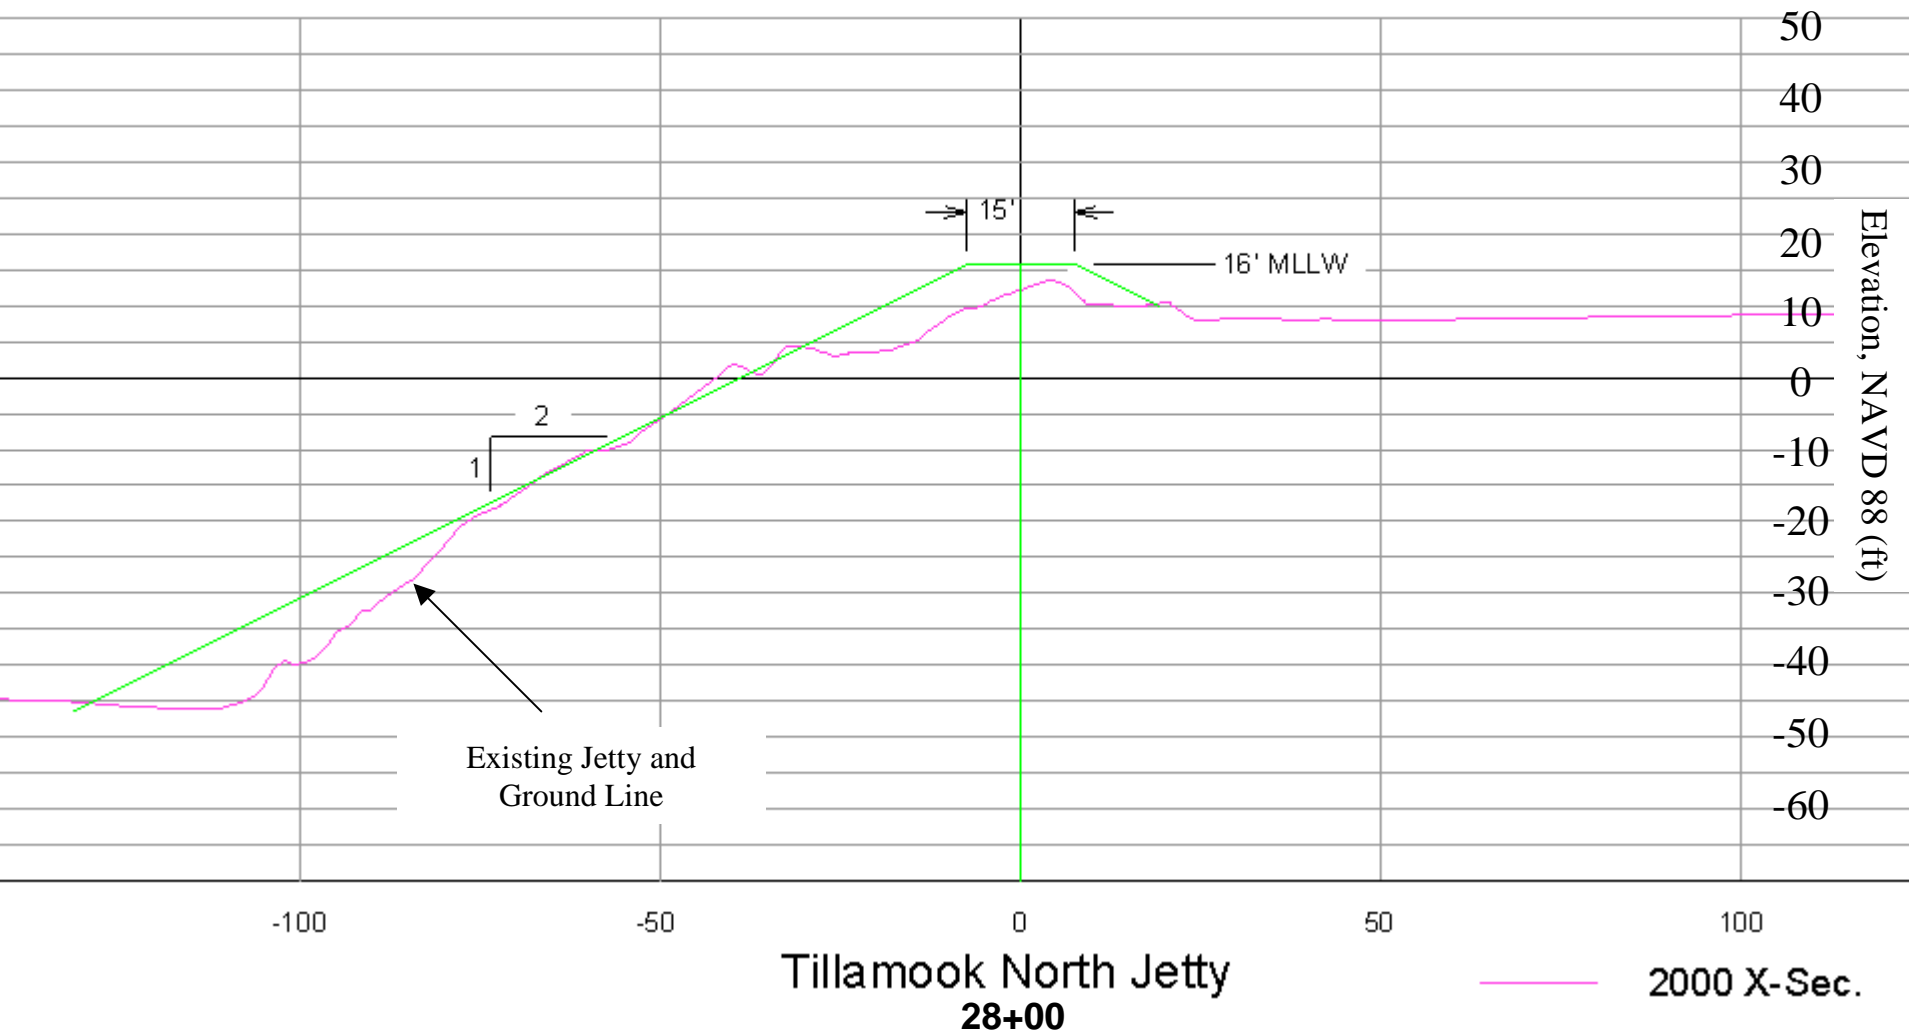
Typical Damage and Repair Design for North Jetty STA 22+00 to 29+50
